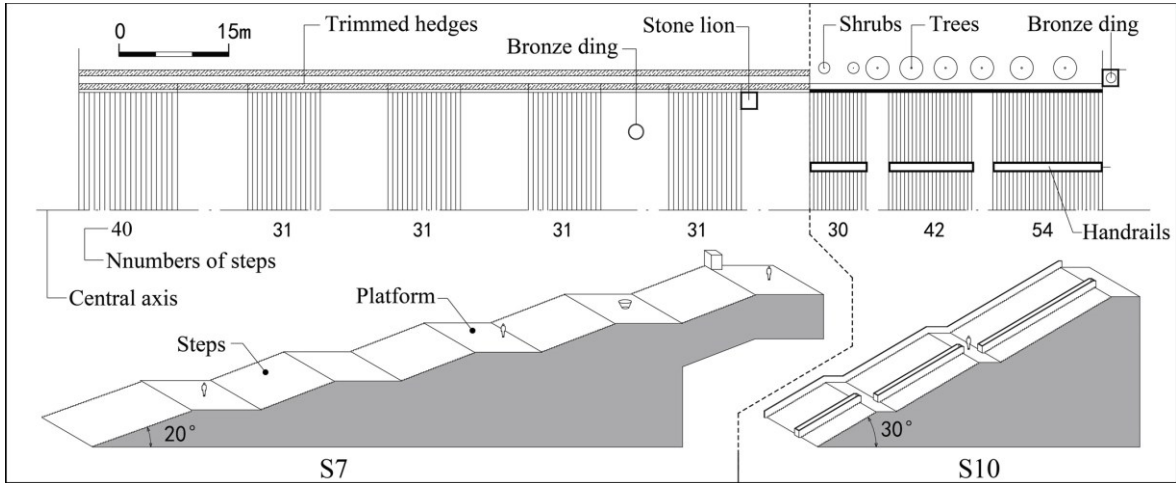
Plan and Axonometric Drawing of the Big Steps
